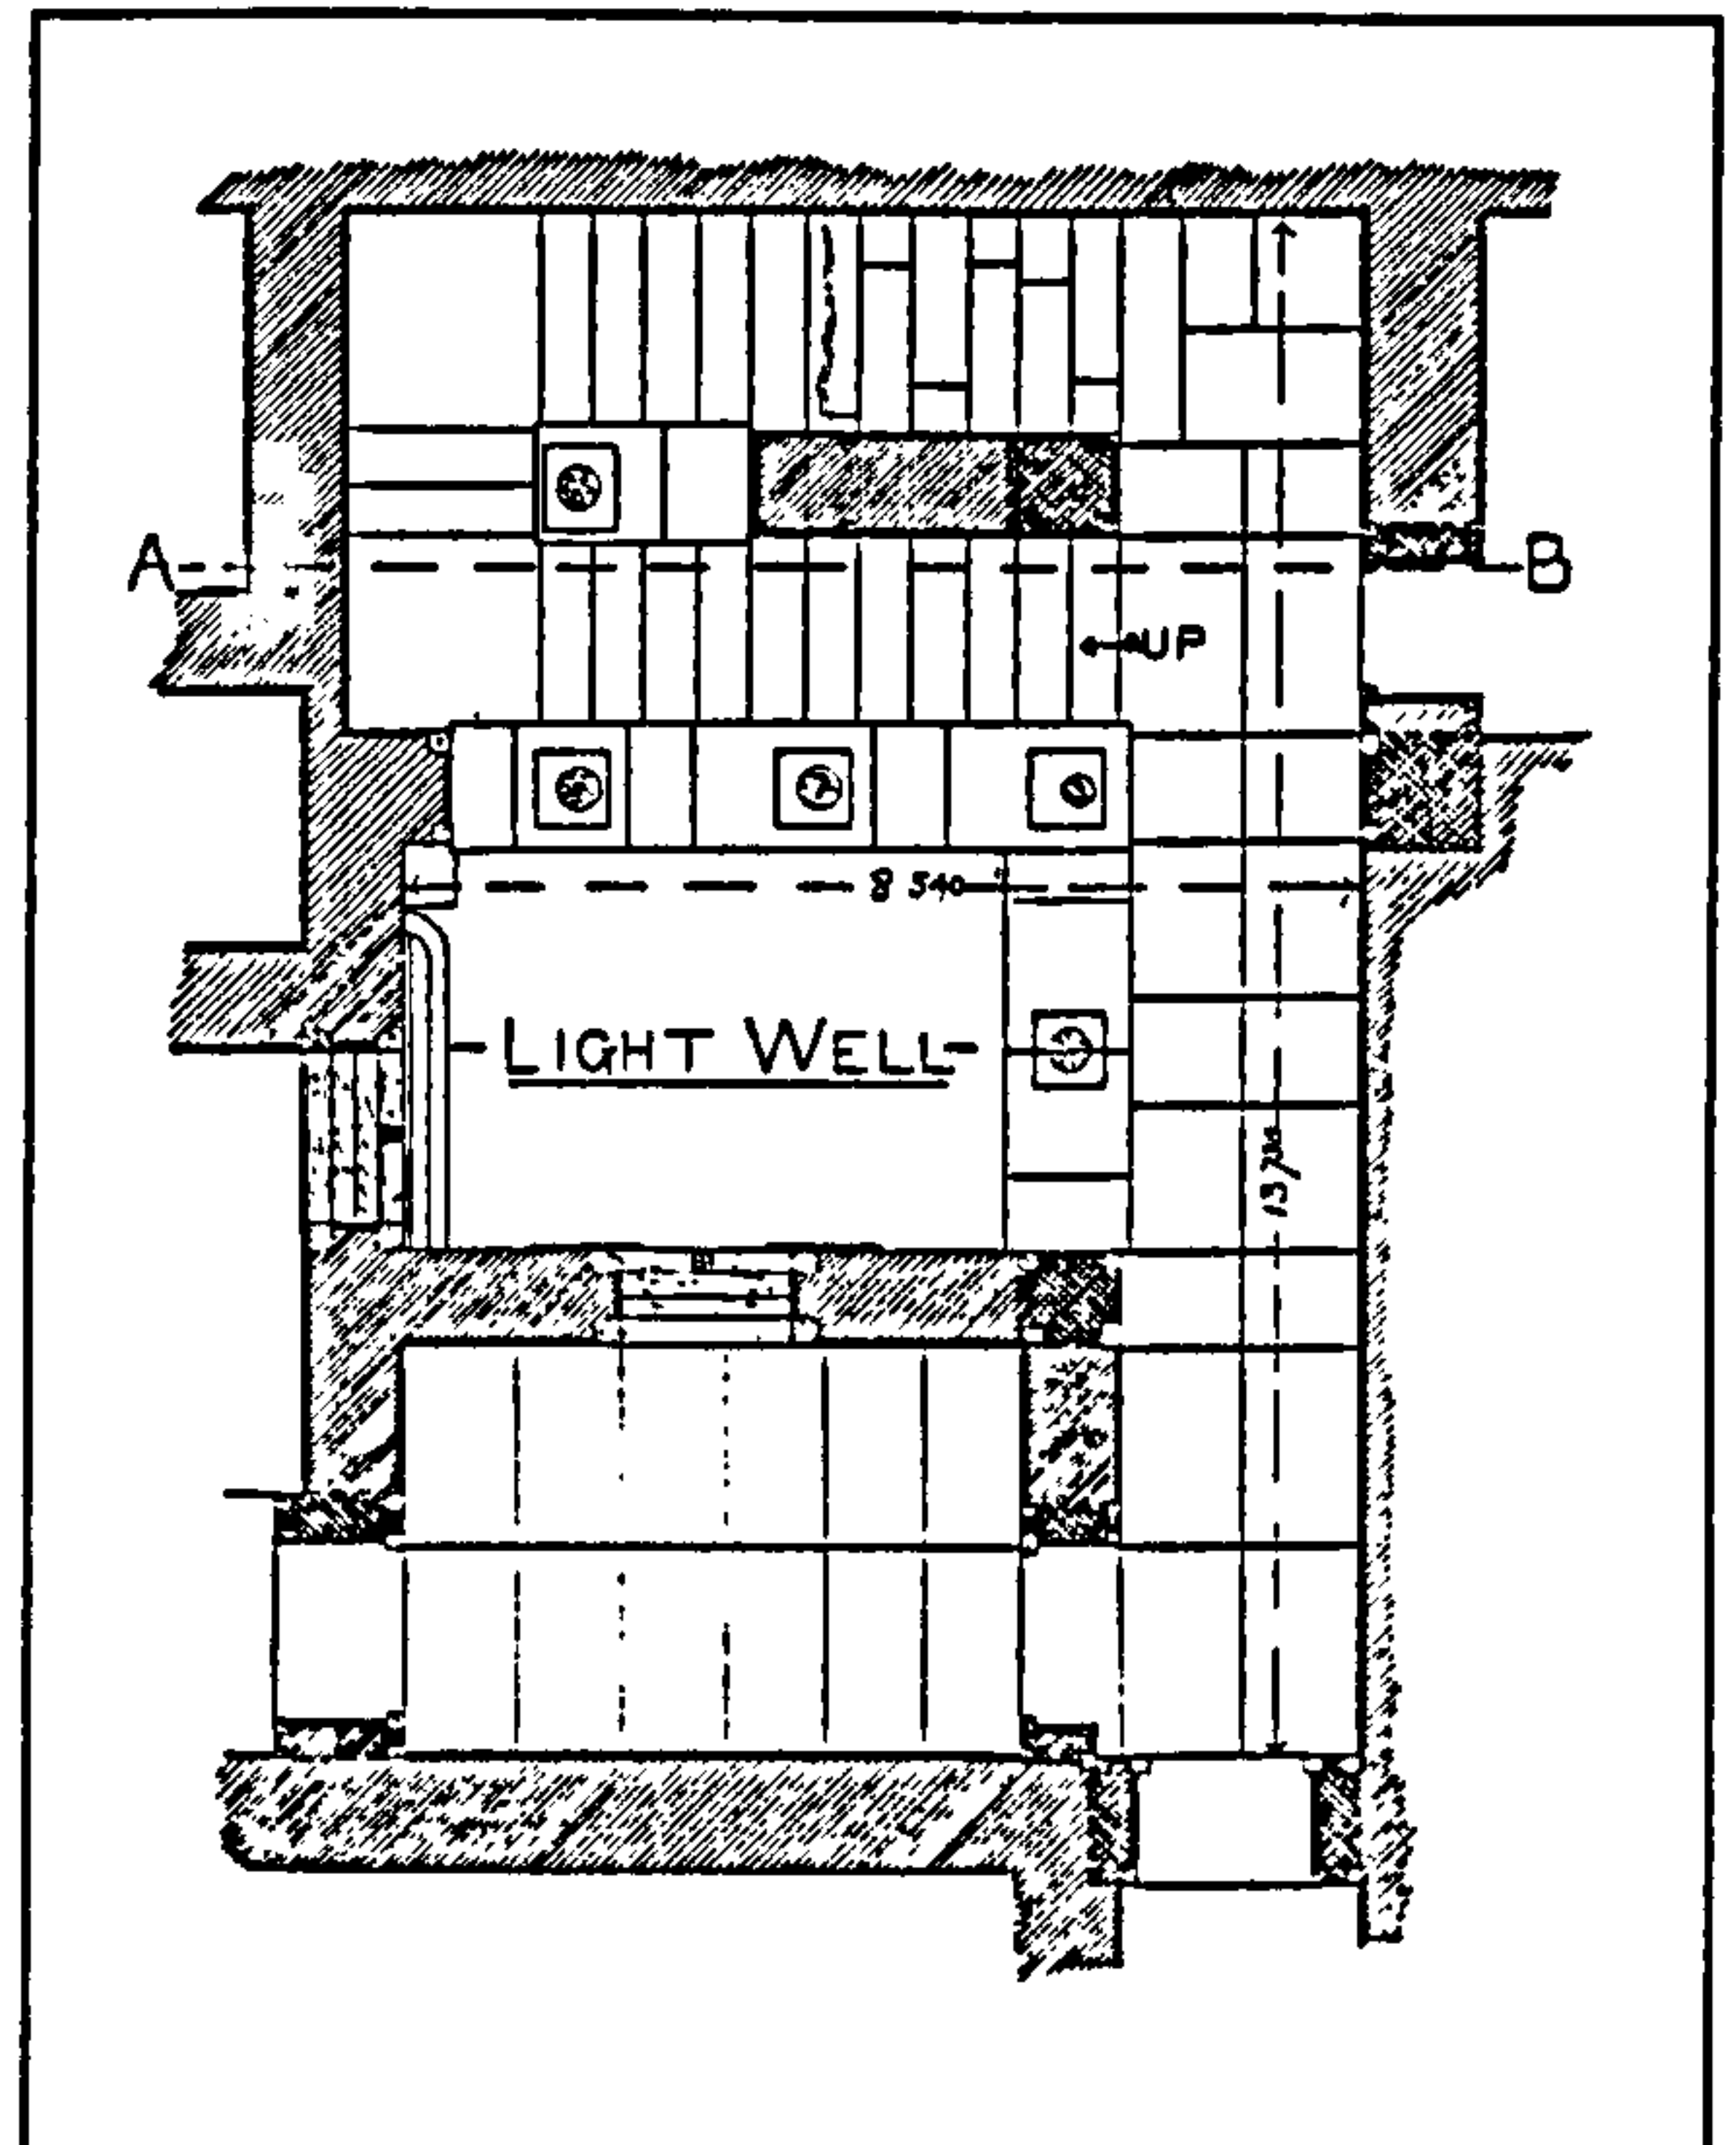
First Floor ground plan, Grand Staircase. Christian Doll, probably 1905.
